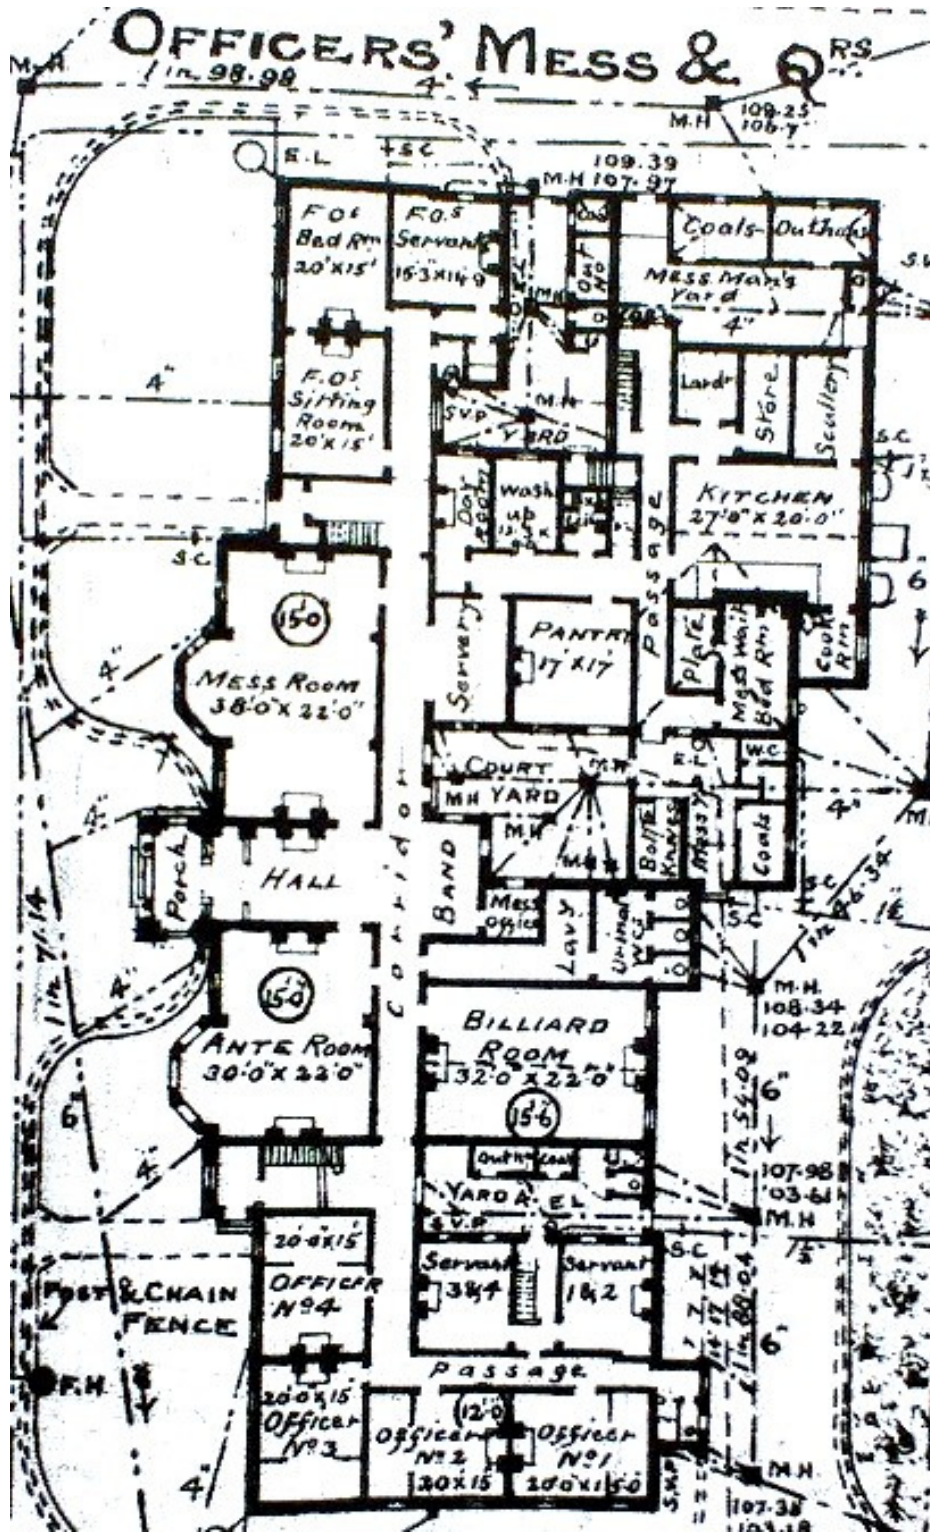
Extract from 1910 plan showing the original function and layout of the ground floor of HYD 08 (EHA 95/1579).
